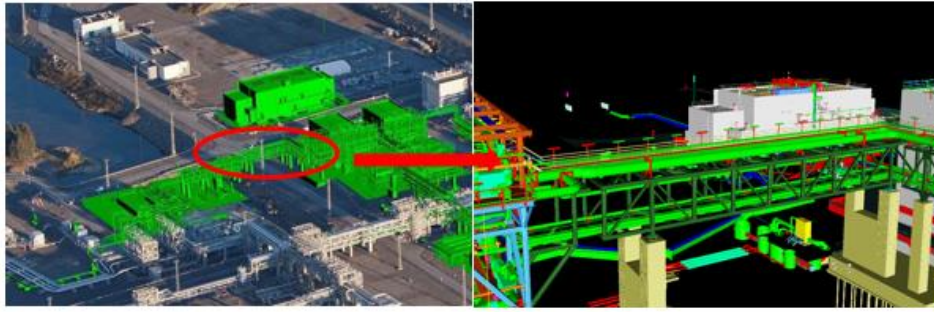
Pipe rack between letdown and booster compression area at Nyhamna.
